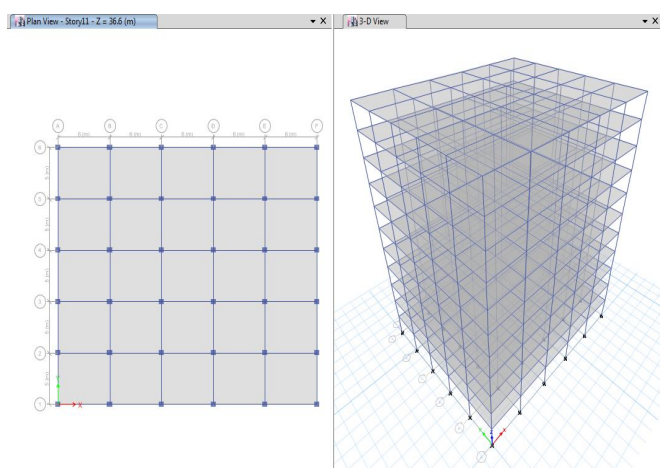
Plan and 3D View of unbraced Building Model at 0 degree angle of sloping
